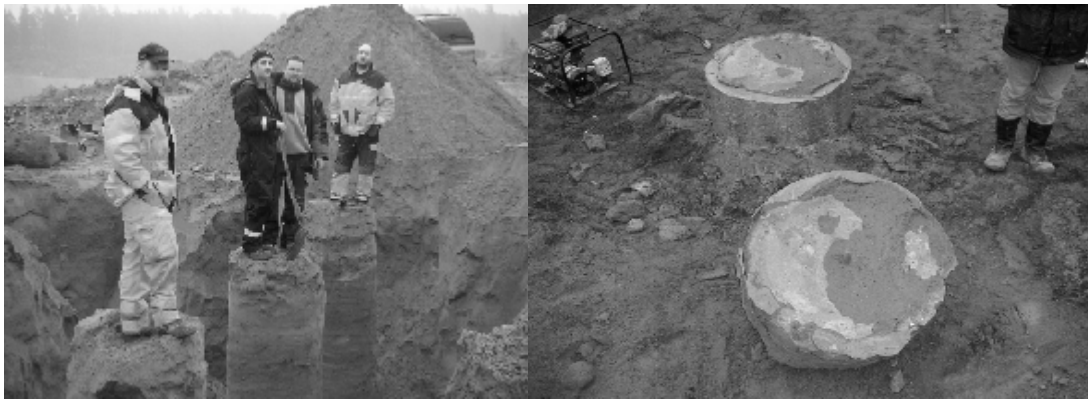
(Left) "Live load" test at Tullinge site. (Right) Cross-section of MDM column, lower plateau.
